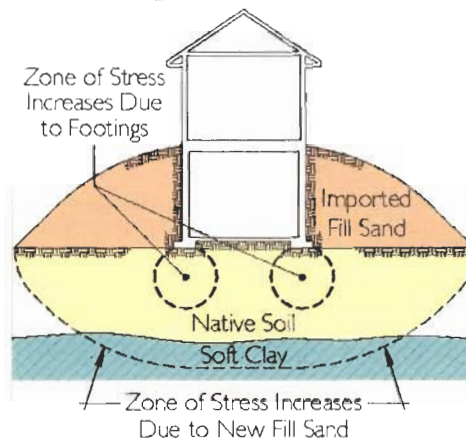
Elevation view showing fill, basement, and stressed zones of soil
